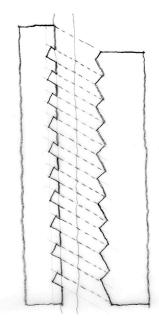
Plan diagram of two-story townhouses at Borgo Panigale, Bologna.
